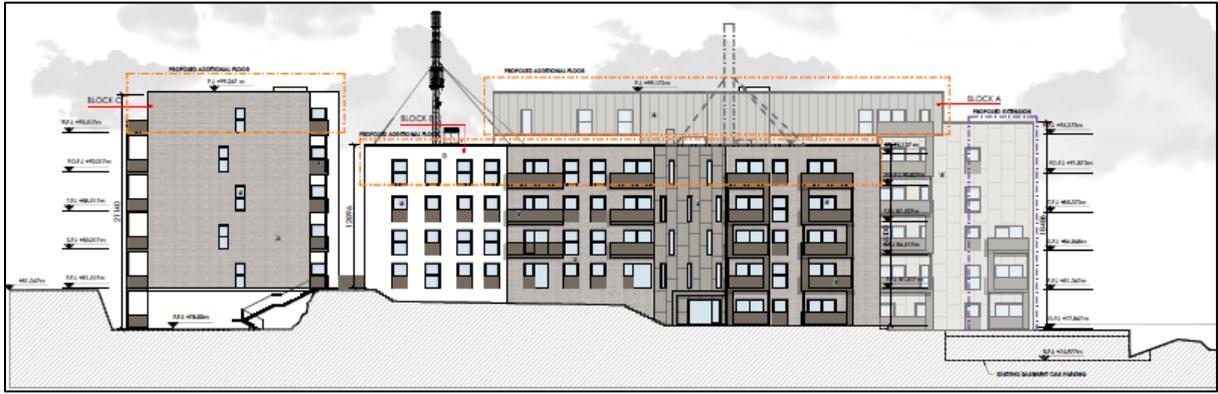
Proposed side (eastern) elevation of Blocks A, B and C
